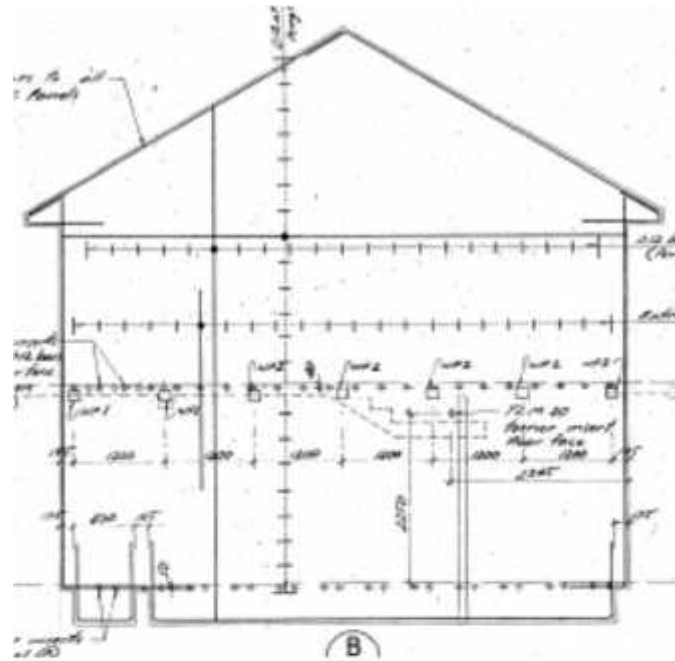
circa 1987 typical pre-cast concrete common wall tilt panel (original).
